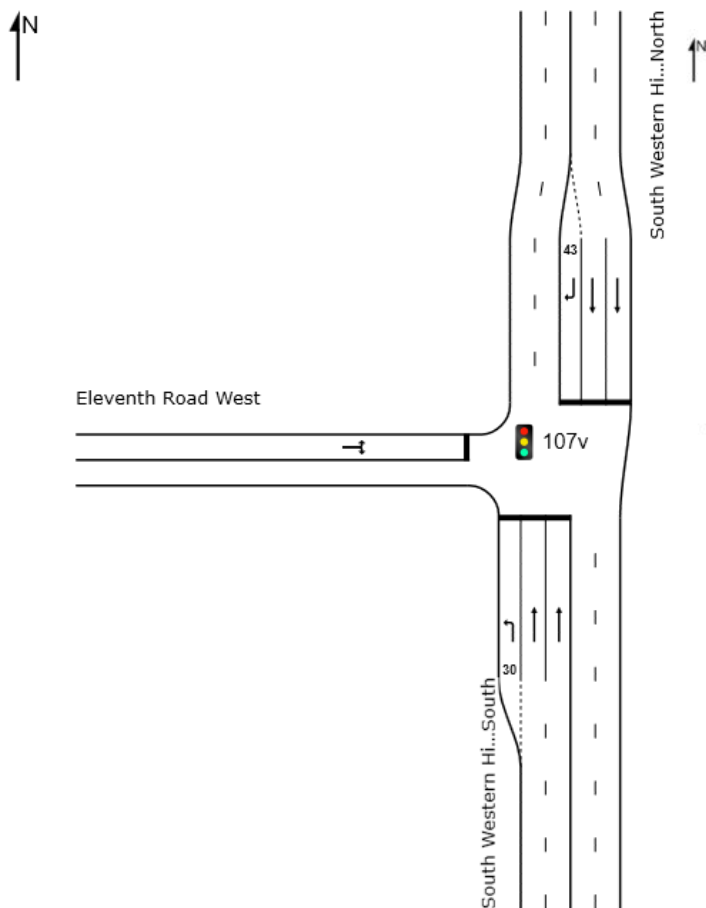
SWH/ Eleventh Road – Signalised intersection option
